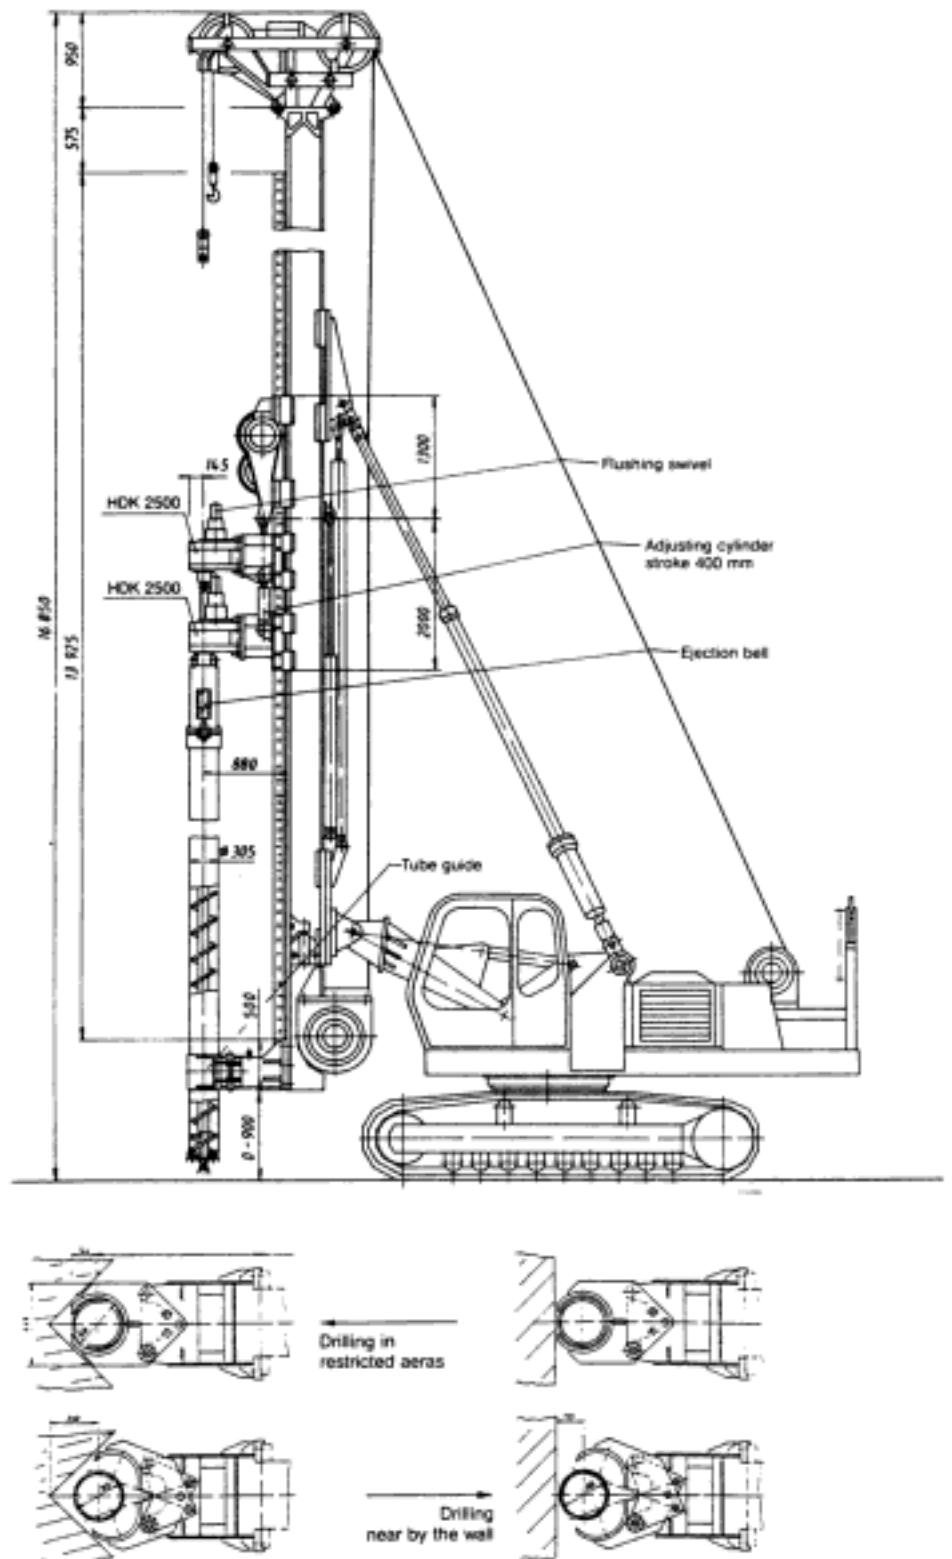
Mini pile rig suitable for contiguous bored pile installation close to existing structures (courtesy of Ingersoll Rand)
